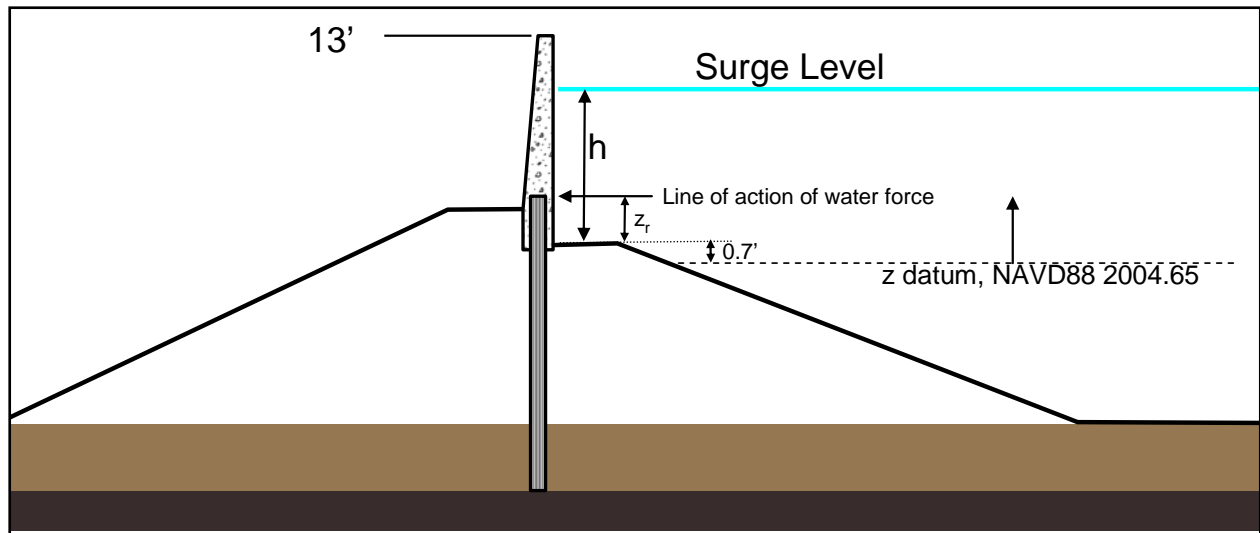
Cross-sectional schematic for London Avenue Canal walls near failure location just south of Robert E. Lee Bridge
